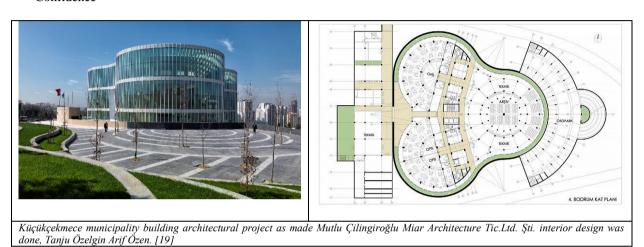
The exterior photograph and Plan layout of Küçükçekmece Municipality service building [19]
